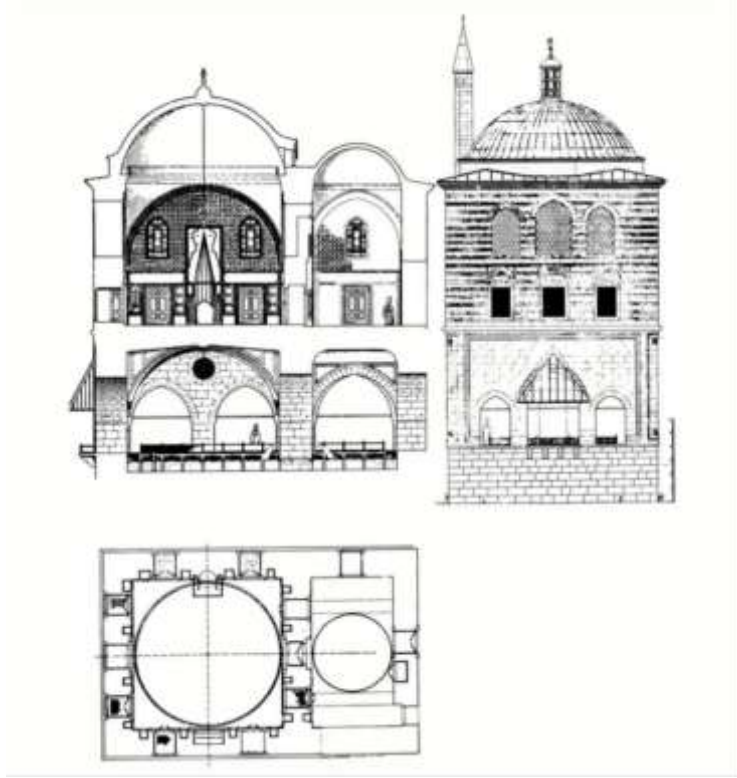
Architectural plan and elevations of the Privy Room of Murad III.
